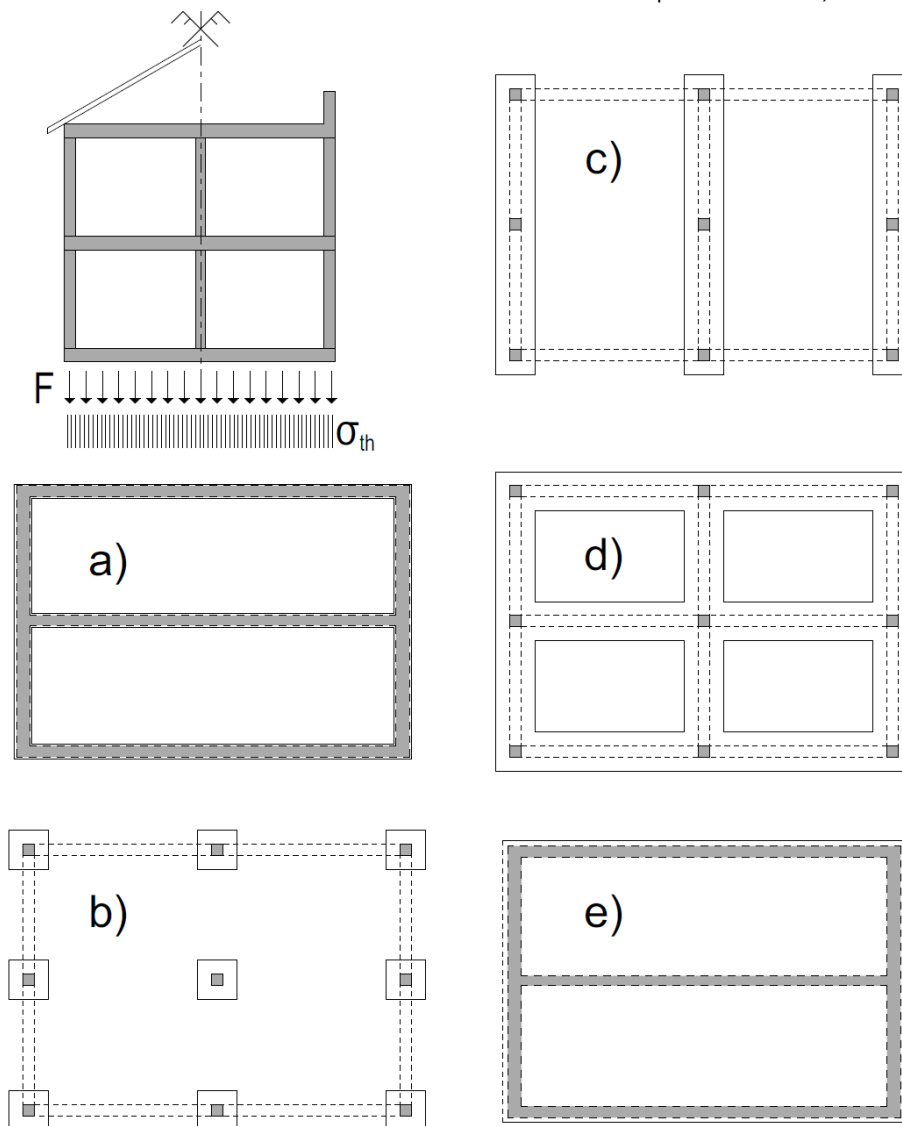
a) strip foundation, b) pad foundation, c) beam foundation, d) grillage foundation, e) slab foundation
